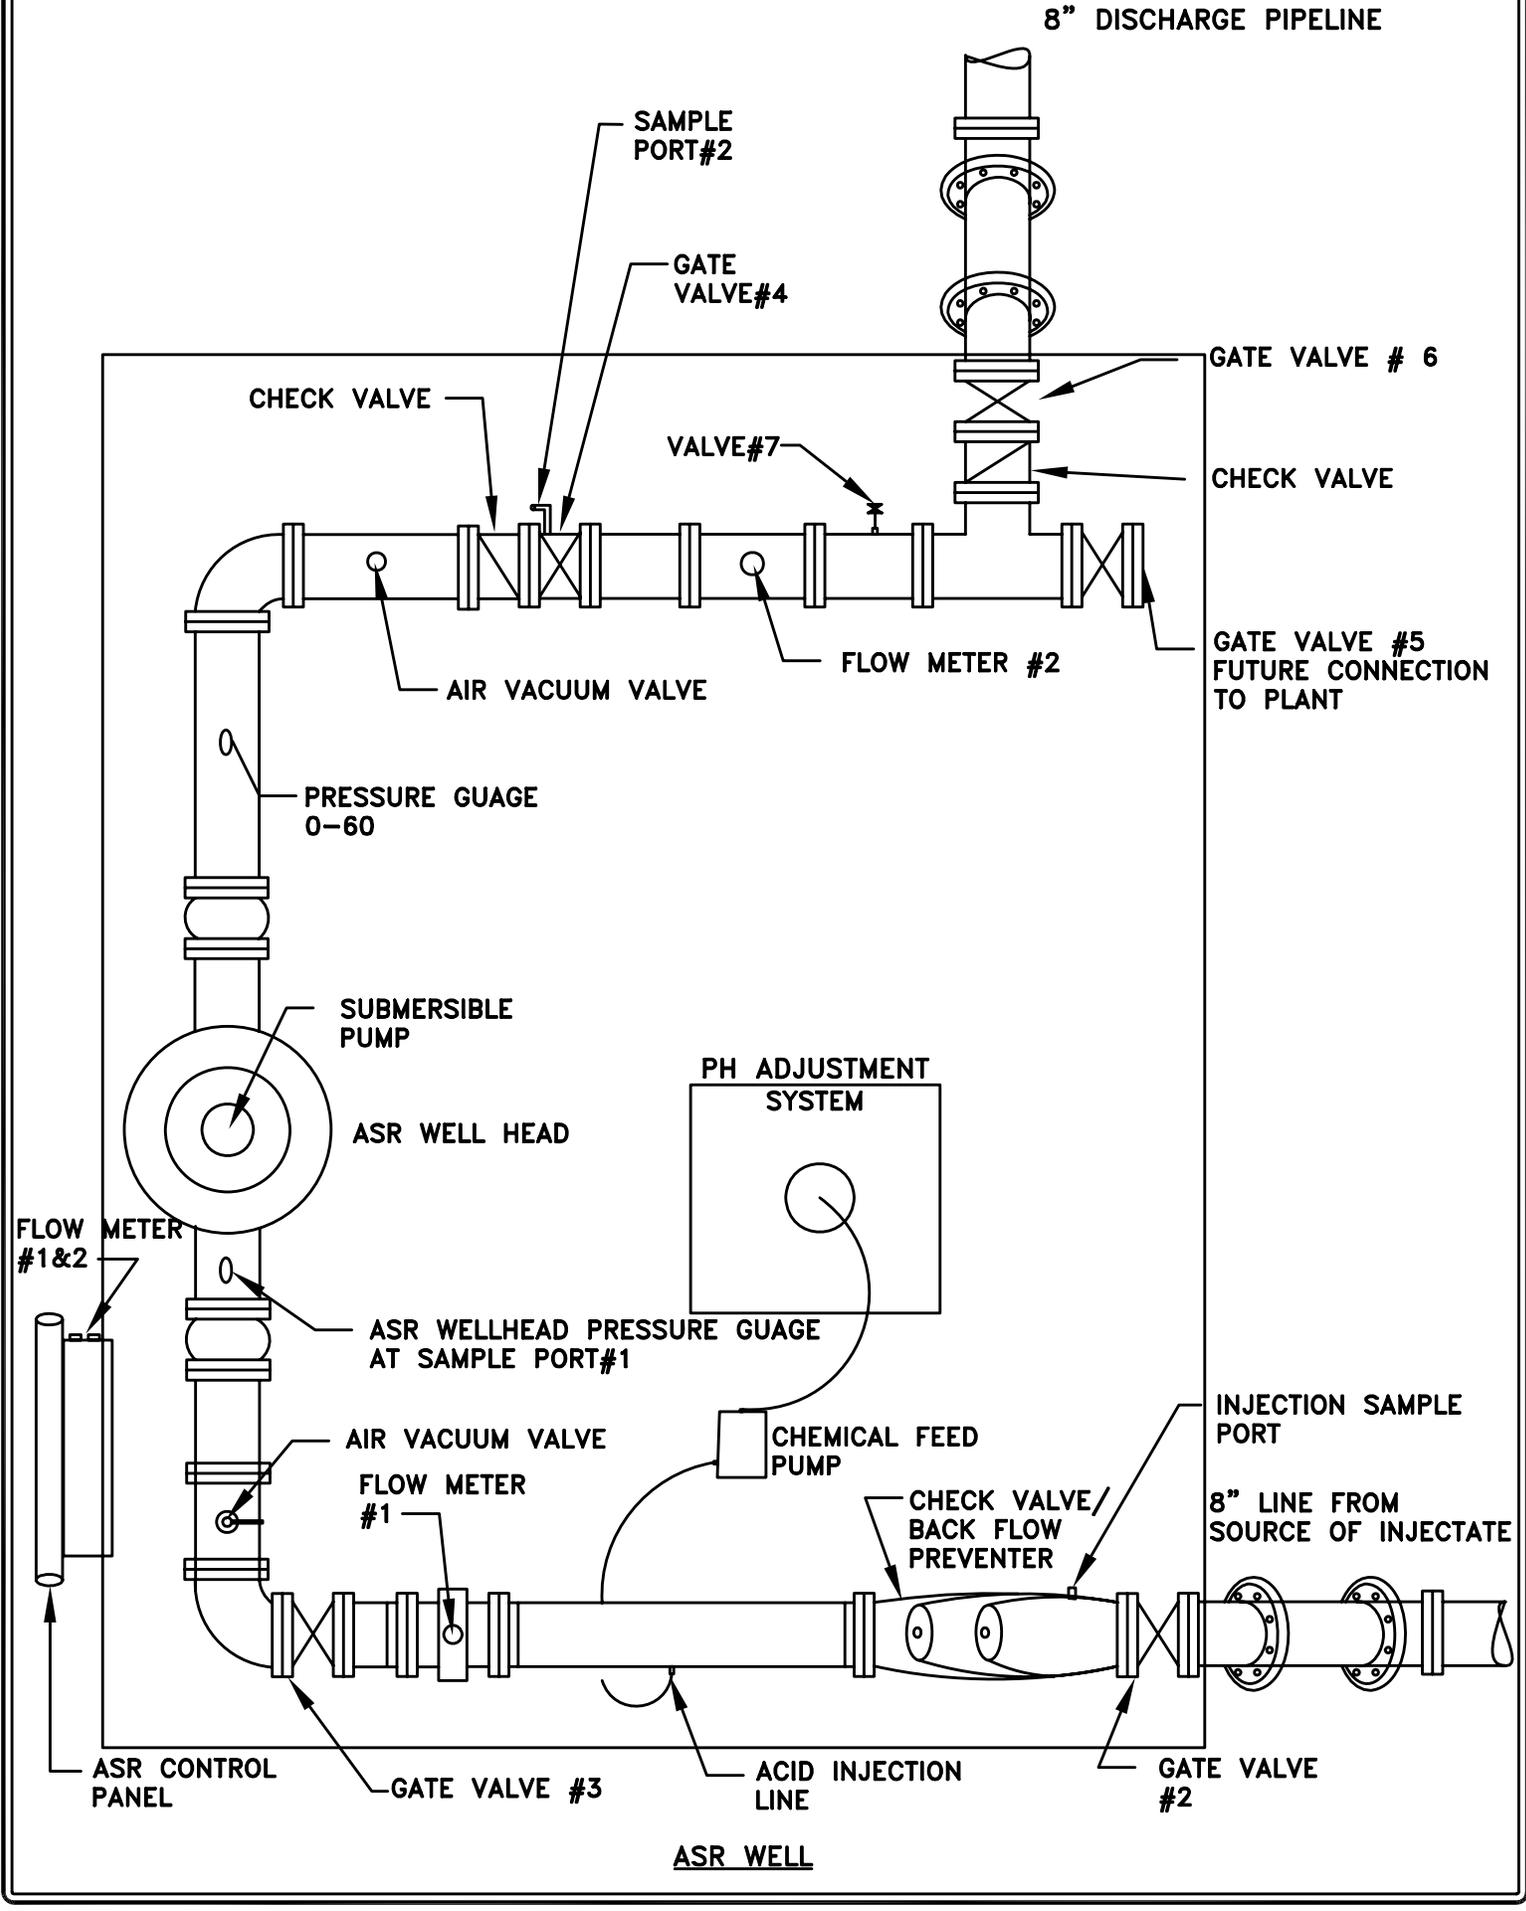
PLAN VIEW OF ASR WELL PAD.
